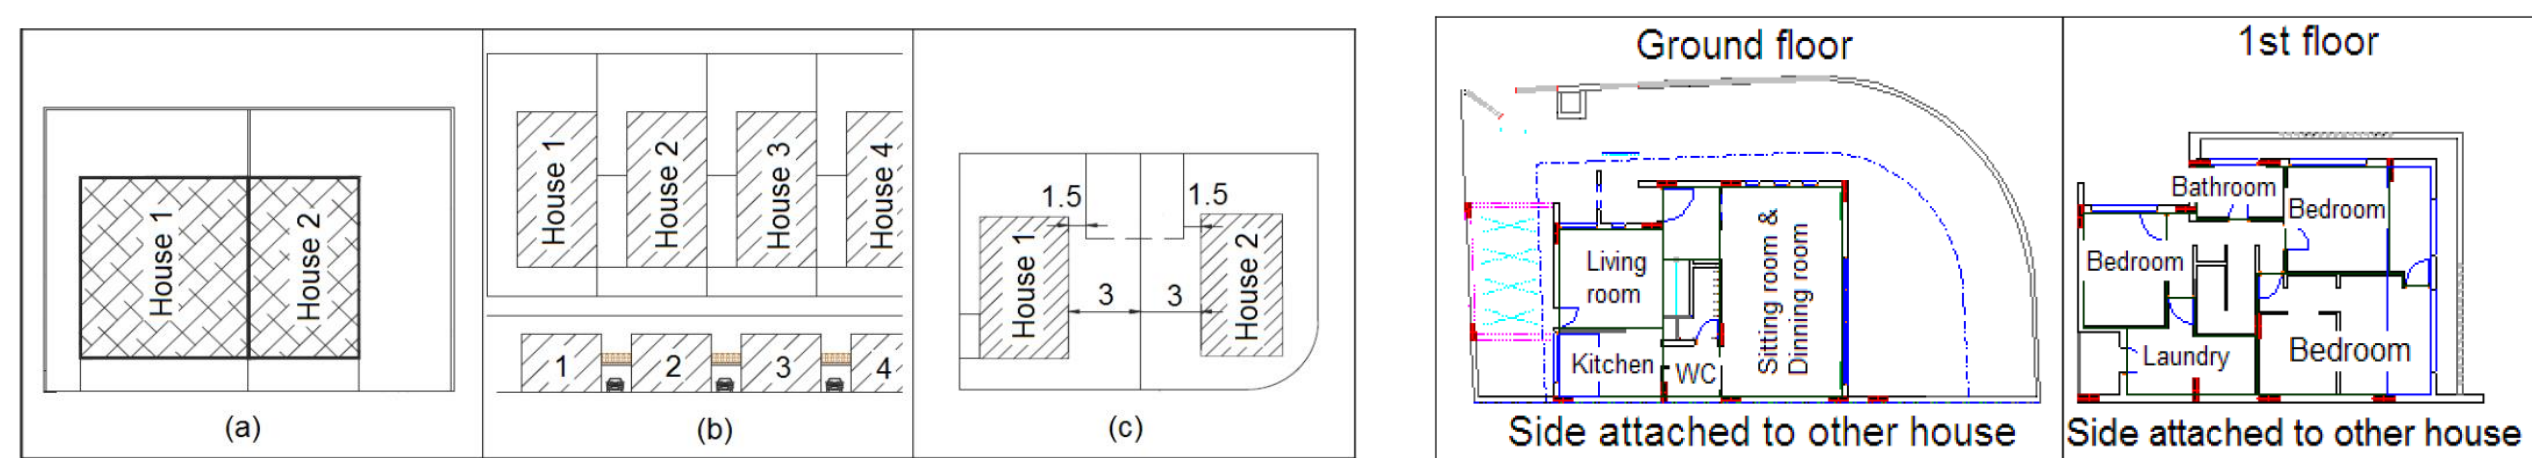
Left: Typical positioning of houses in plots; units in meters, (a) semi-detached, (b) linked detached and (c) detached, Right: Plan views of the typical house used for the estimation of the heating and cooling load
